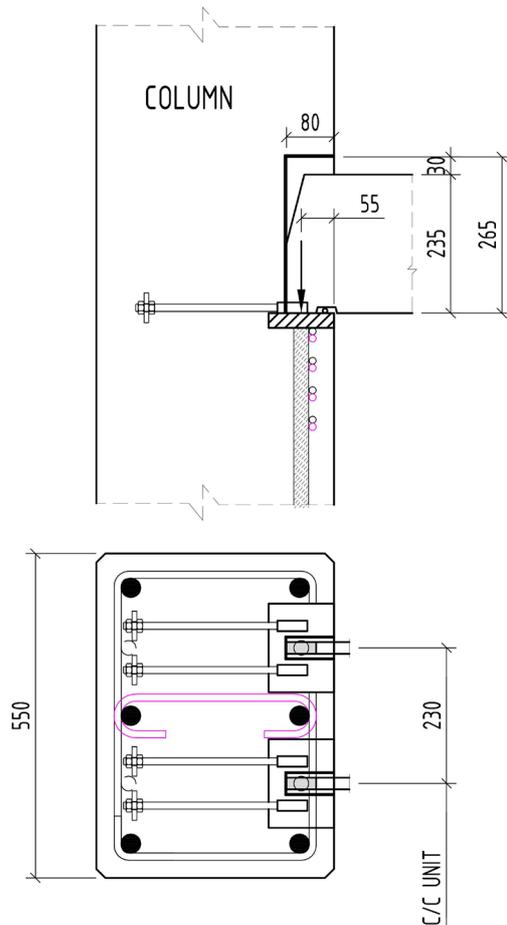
BSF300 column unit. (Reinforcement are not illustrated complete.)
